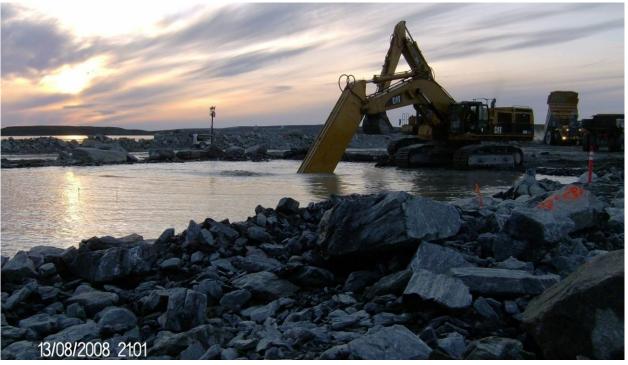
East Dike rockfill placement to Sta. 60+500, trench excavation to approx. Sta. 60+320, August 9, 2008.
